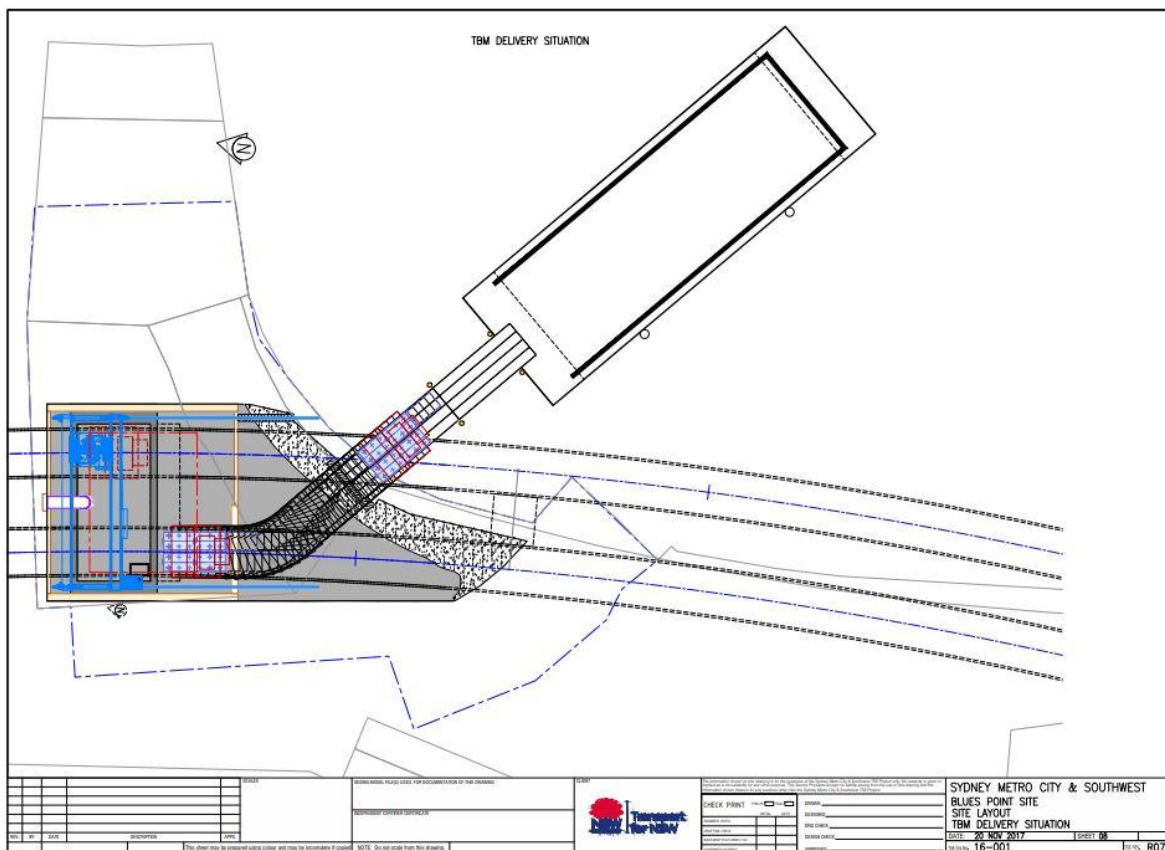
Indicative site layout barge arrangement (source: JHCPBG) (to be updated with current design including six piles for ramp and two mooring piles)
